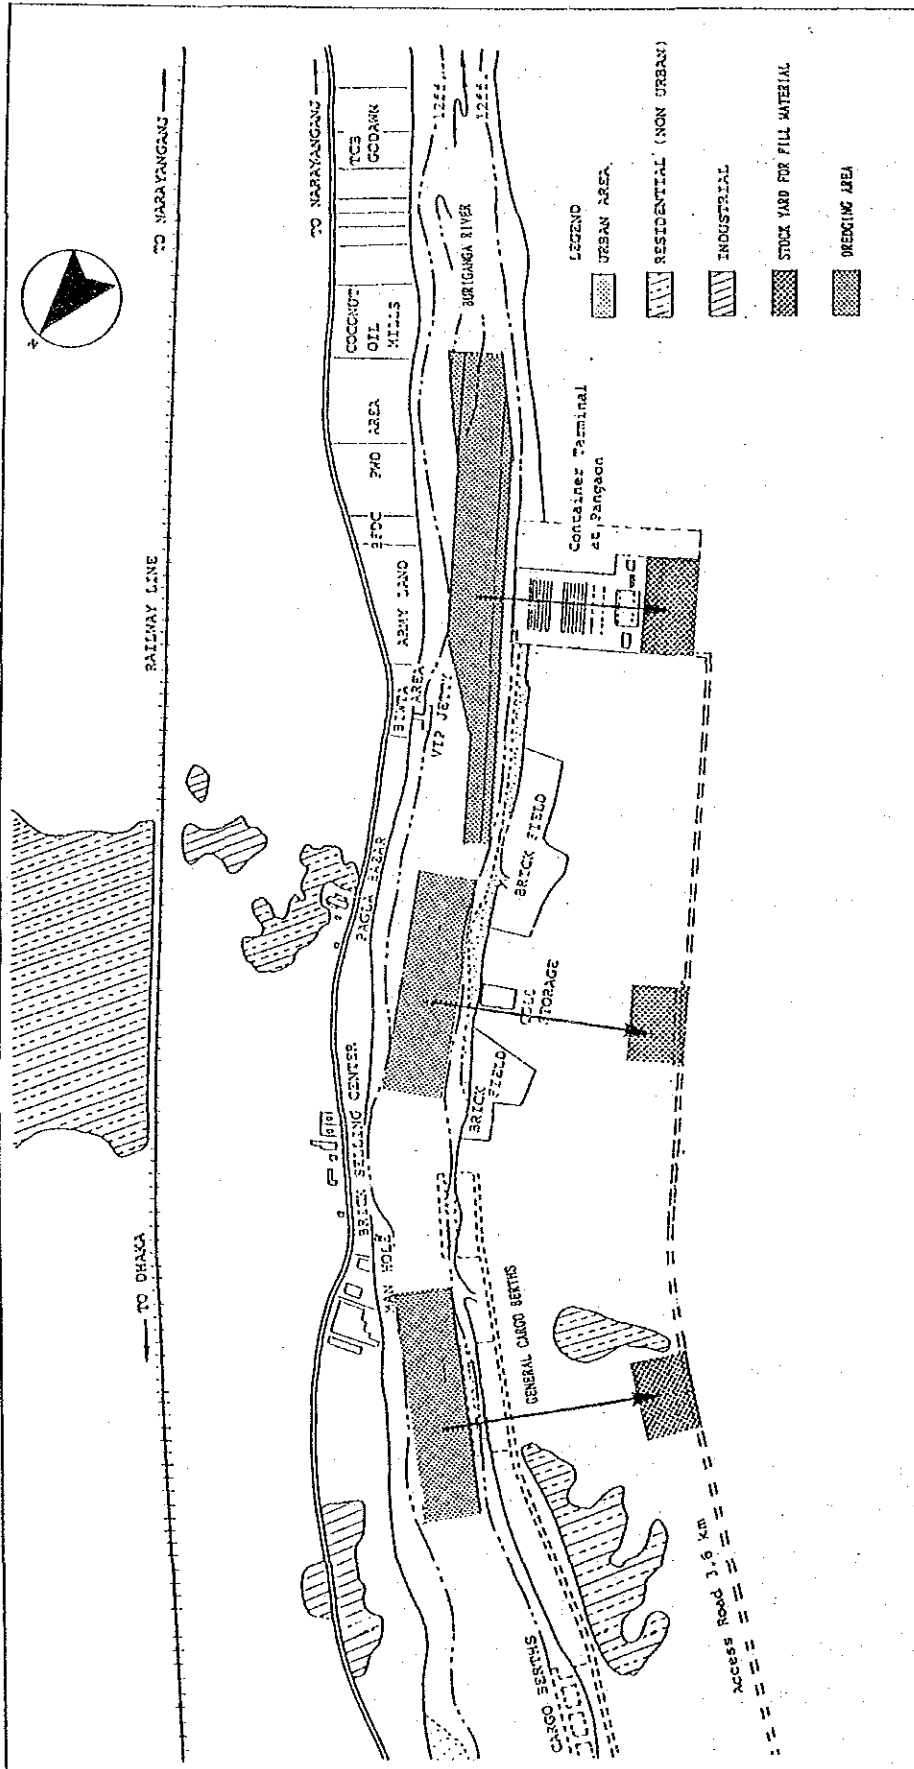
LAND RECLAMATION PLAN AT PANGGAON SITE
